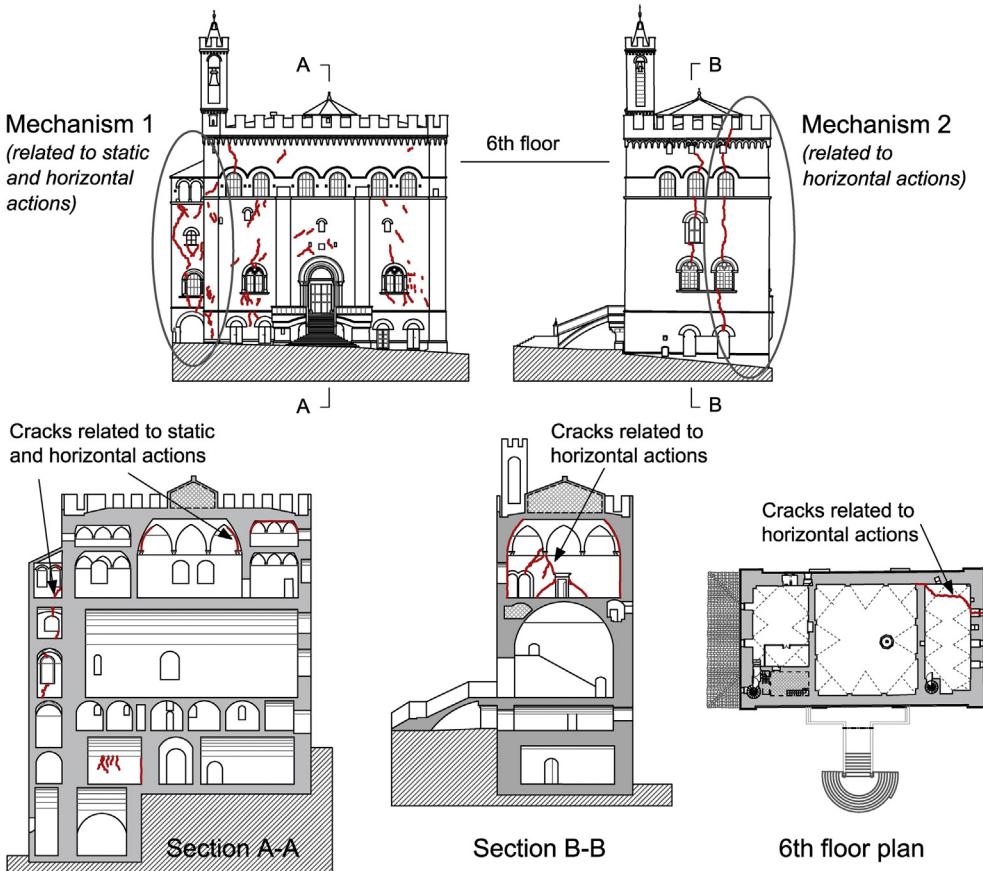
Survey of structural cracks on the East and North façades of the Consoli Palace, highlighting the two possibly activating local failure mechanisms by plan and internal sections views.
